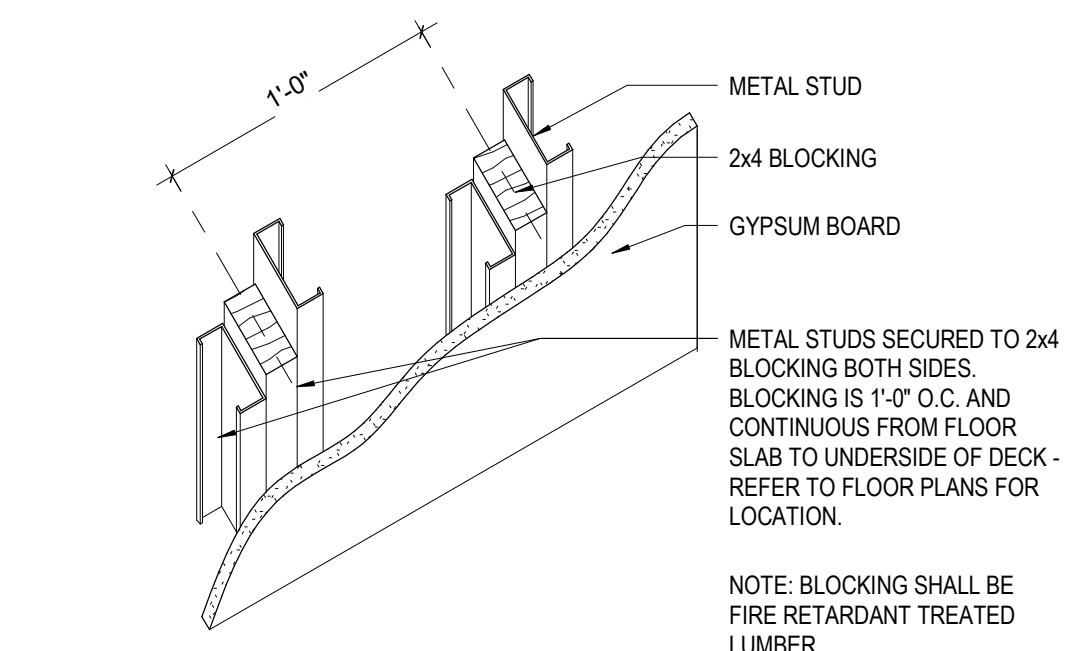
D: METAL STRAPPING - VERTICAL / AXON
